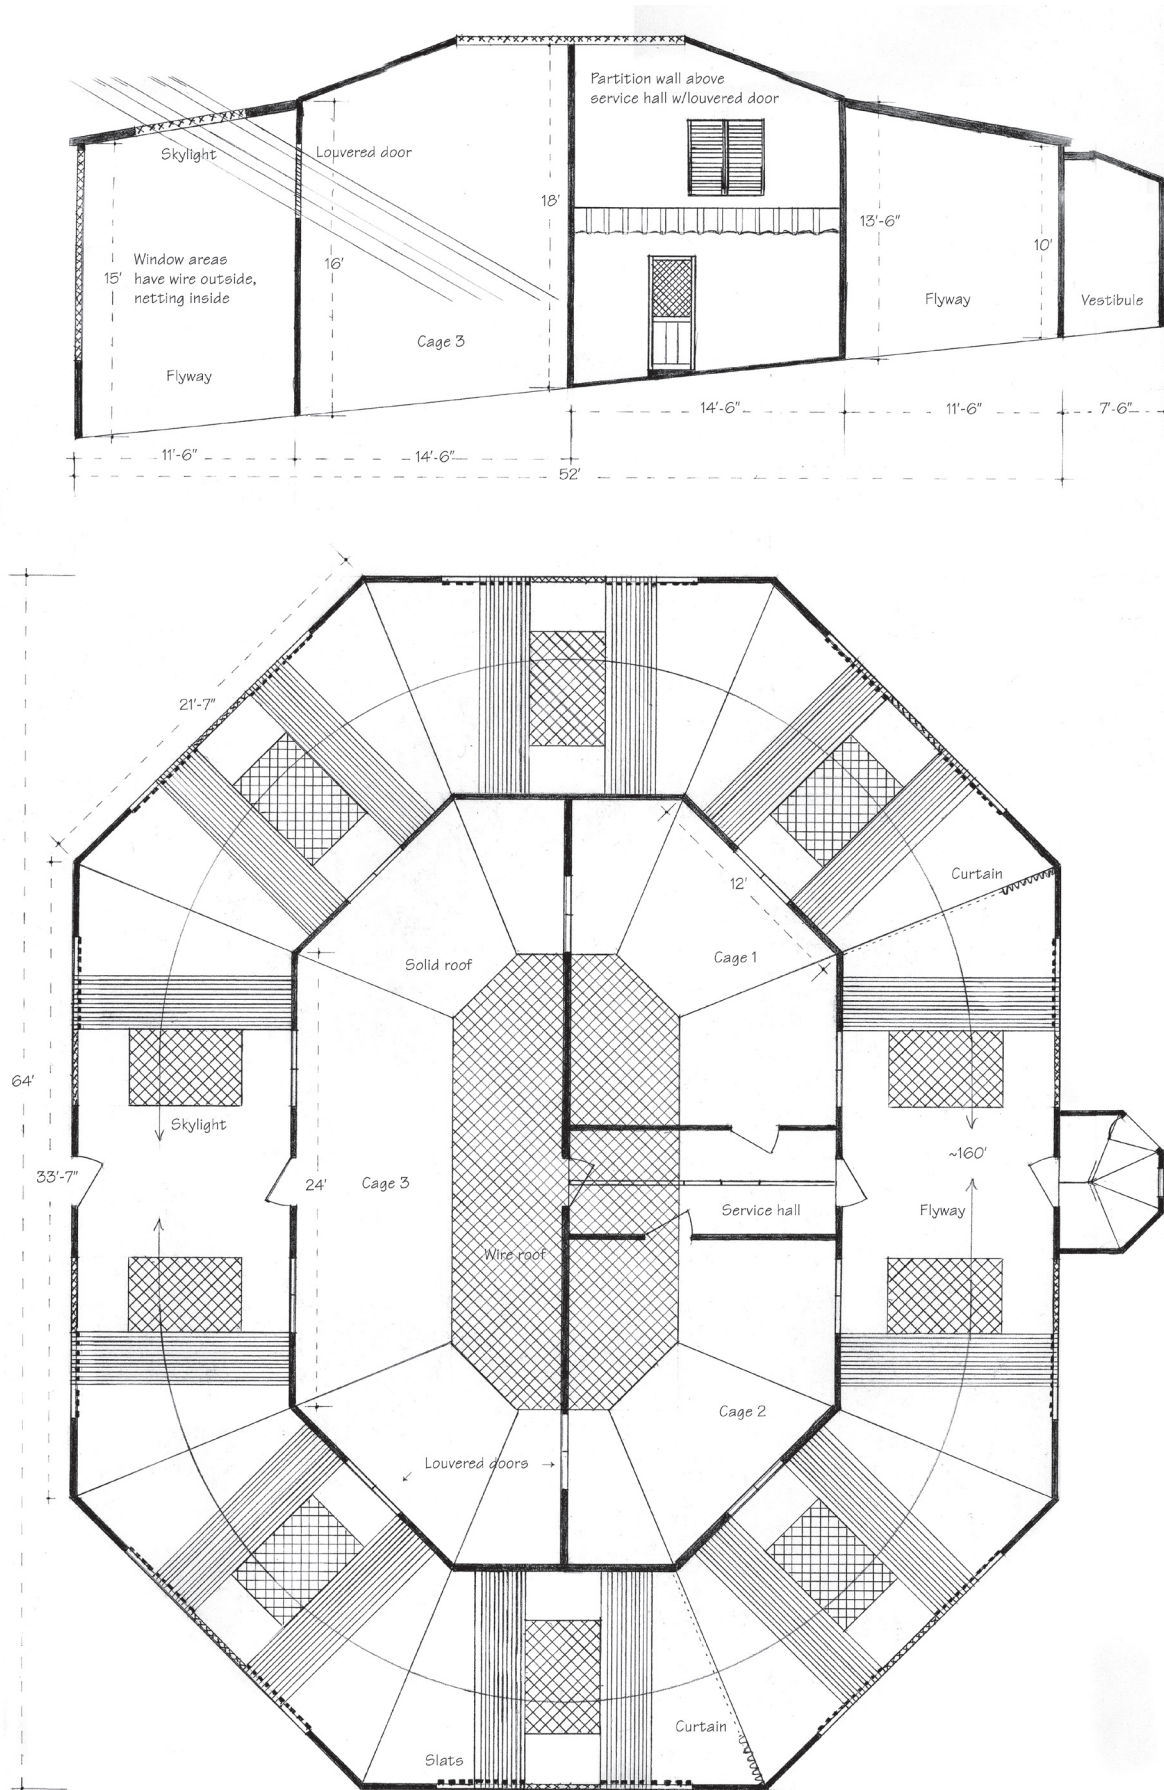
Floor plan and elevation profile. Floor plan shows interior cage layout plus door location, roof design, etc. Dark lines represent solid walls; light lines indicate roof sections. Elevation shows a cross-section of the compound. Note how angle of door louvers maximizes exposure to sunlight from wired section of flyway roof.
